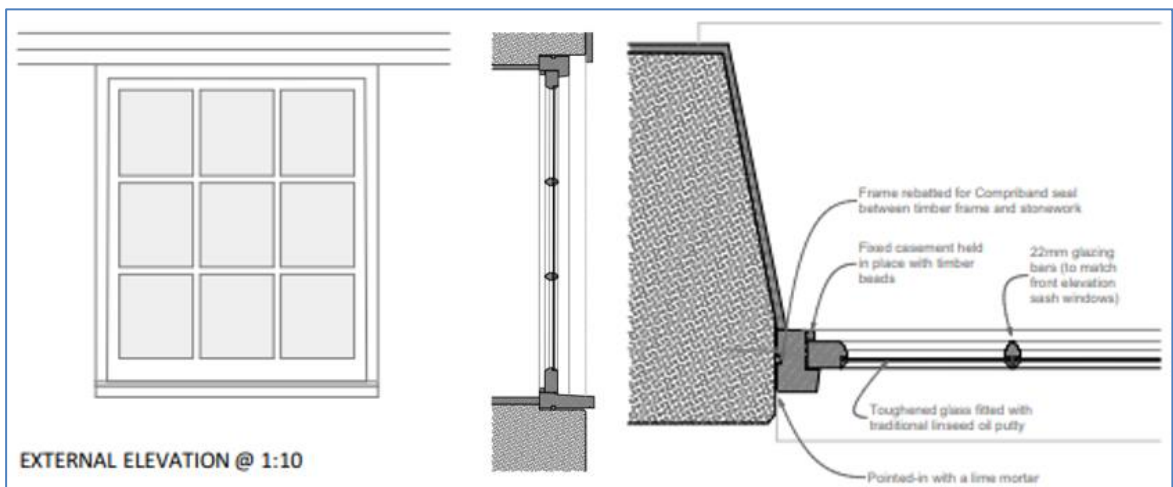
FW2 Window Extract from plans showing details of materials (if available)
